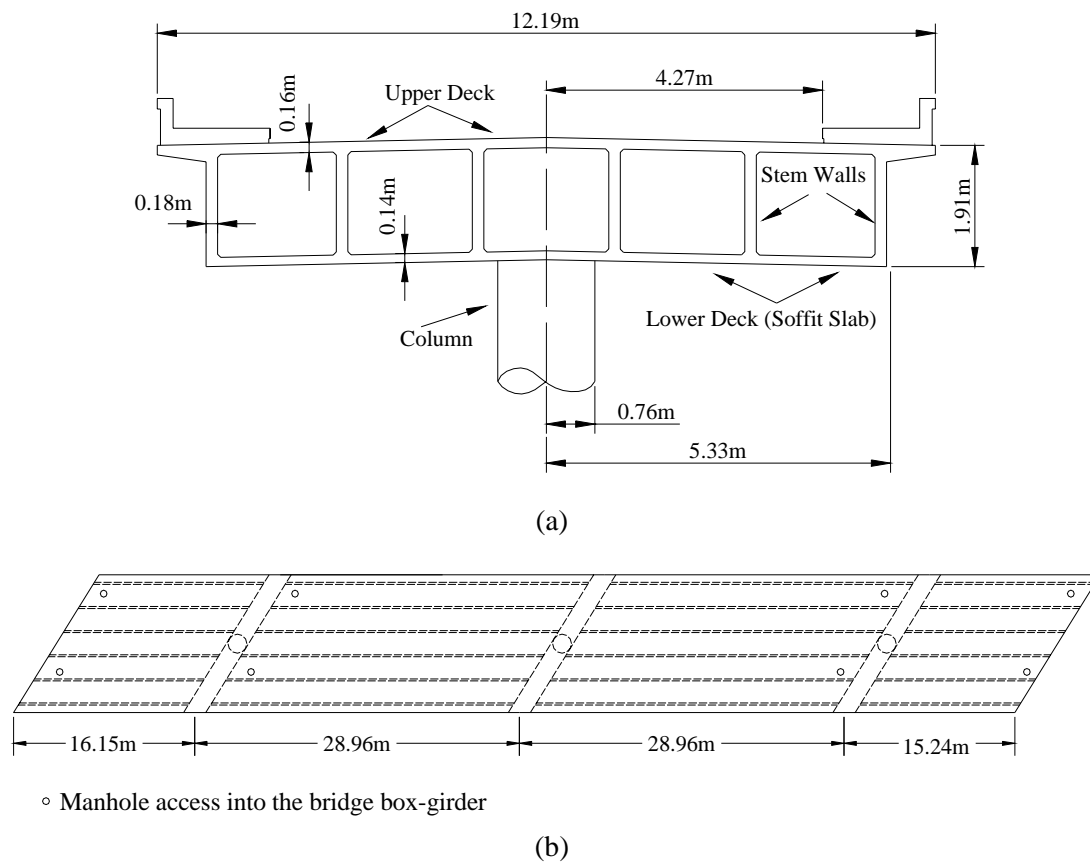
(a) Cross section of Voigt Bridge; (b) Plan view of Voigt Bridge
